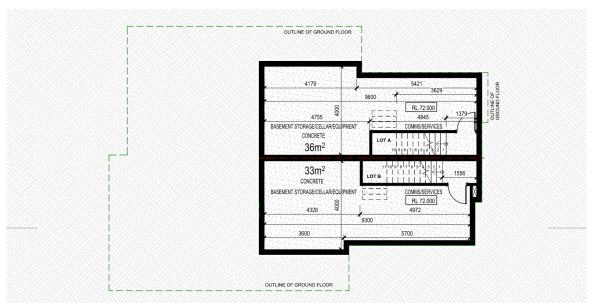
Proposed Basement Level - 34 Frenchmans Road
